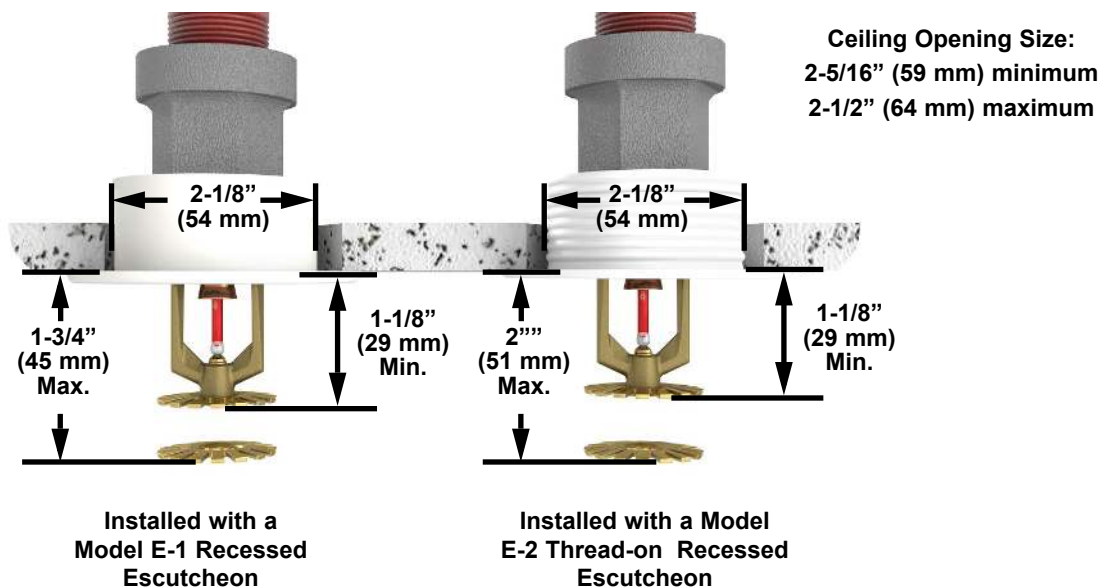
Sprinkler Dimensions with the Model E-1 and E-2 Recessed Escutcheons
